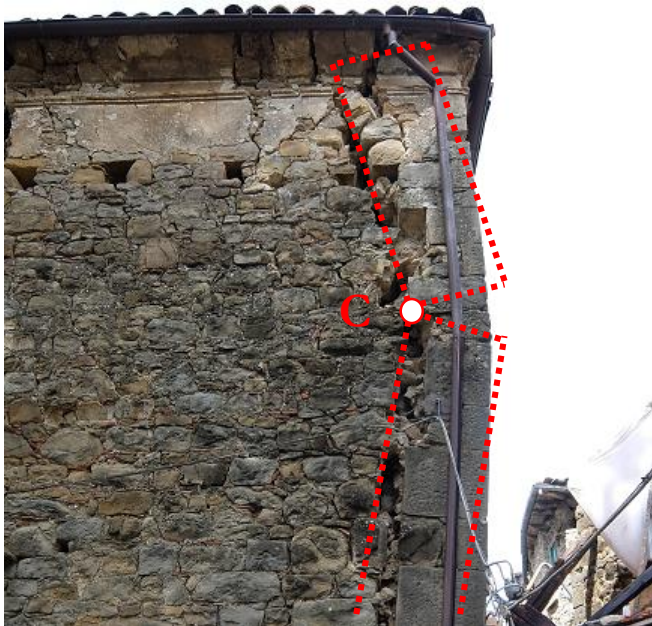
Vertical bending of masonry wall due to earthquake Central Italy, Illica, 2016
